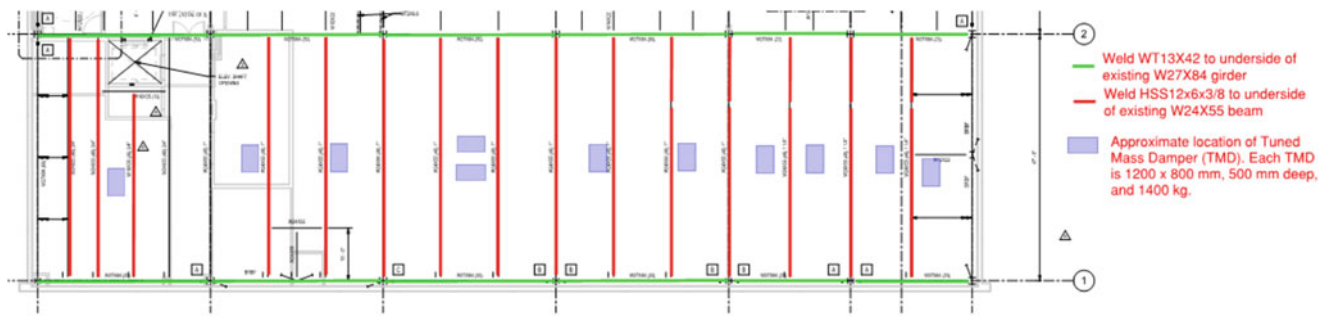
Case 6 – Level 2 structural framing plan showing location of new WT and HSS members and TMDs
